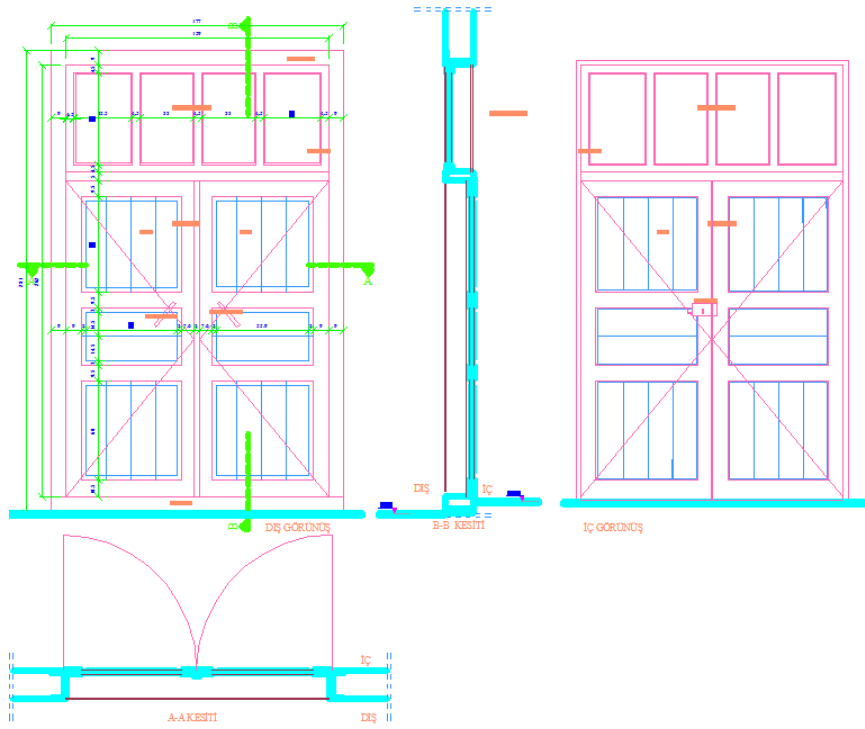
İbrahim Pilavcı House of restoration entrance door detailing.
